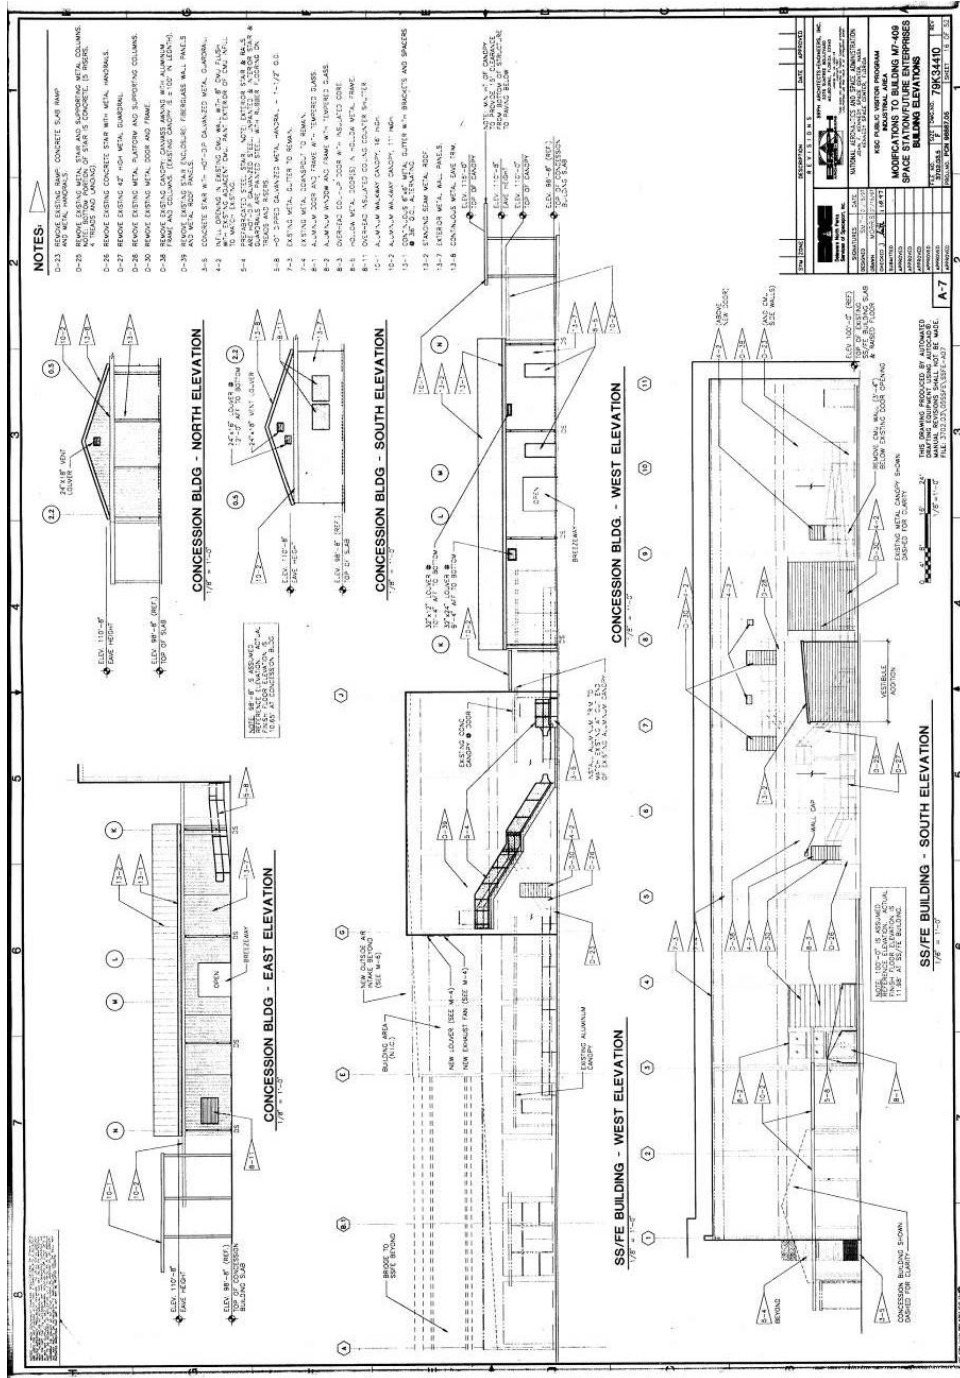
BRPH Architects & Engineers, Modifications to Building M7-409, Building Elevations, January 1997, Sheet 14 of 52.
